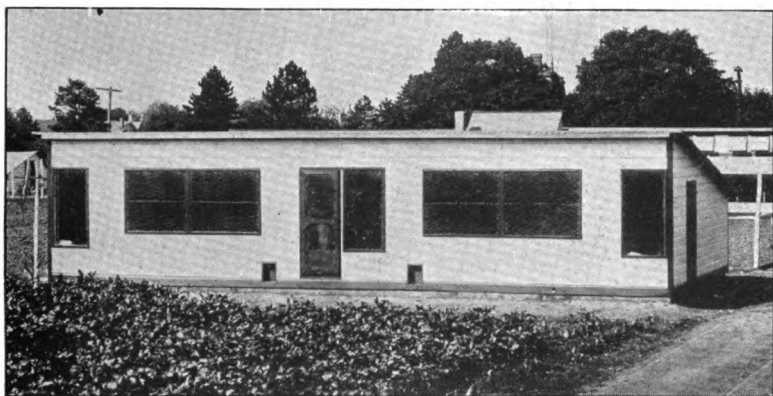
Multiple unit laying house complete. The double section house, 40 feet by 20 feet, with a capacity of 200 birds.
